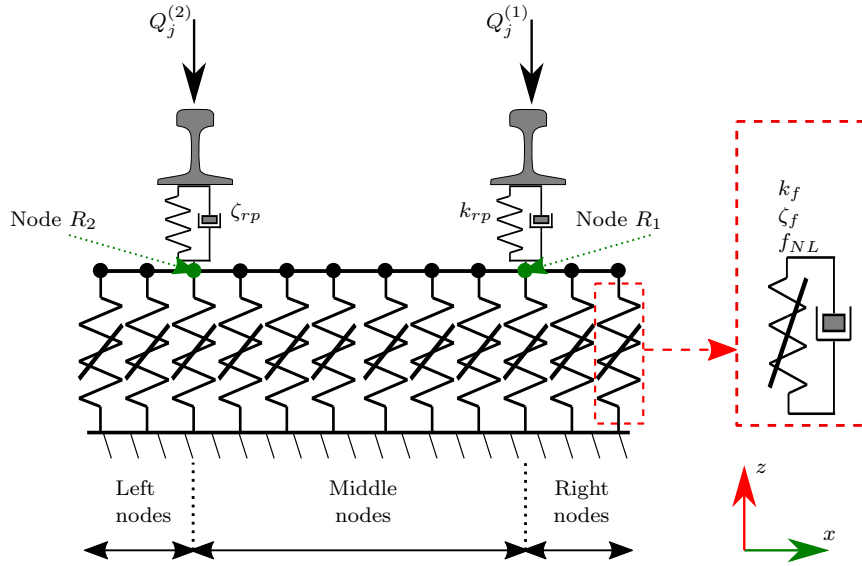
Finite element model of the railway sleeper posed on a nonlinear foundation and subjected to the moving loads
